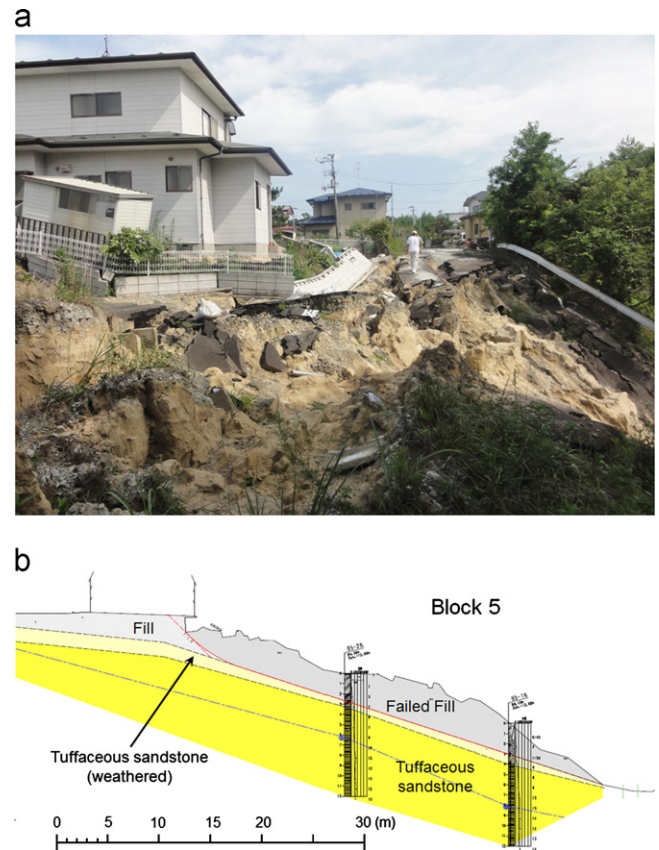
(a) View of slope failure in Block 5 (house hangs precariously on edge of failed slope) and (b) cross-sectional profile of failed slope in Block 5.
